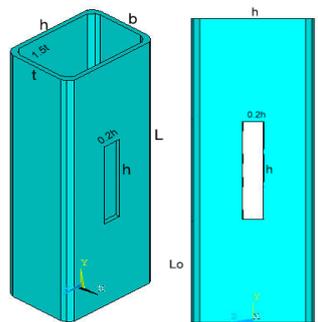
Geometry specimen column in research AL-Shareef [7]
